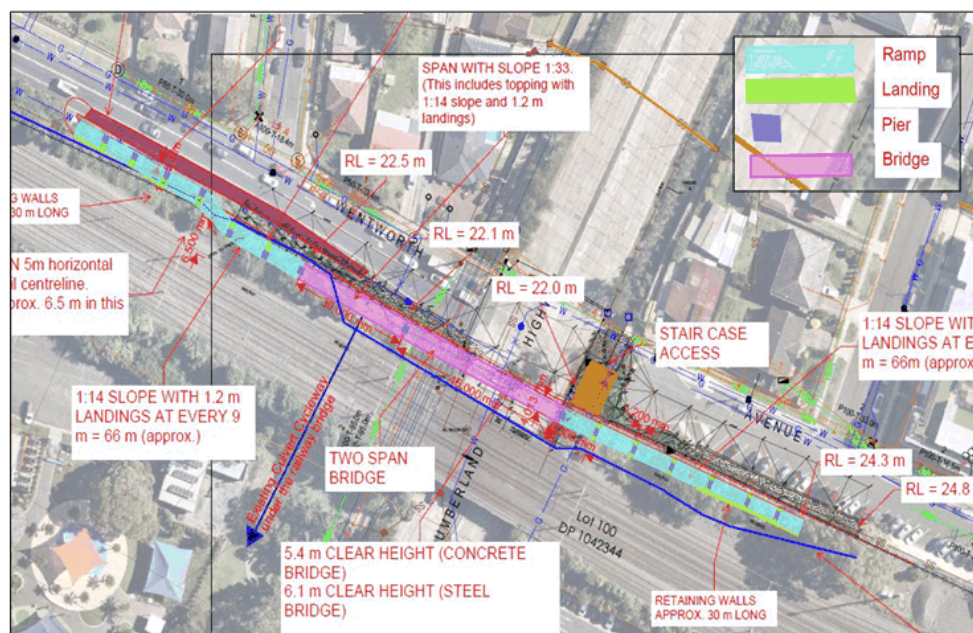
Stage 2 Concept Plans (Cumberland Hwy Overbridge in plan)
